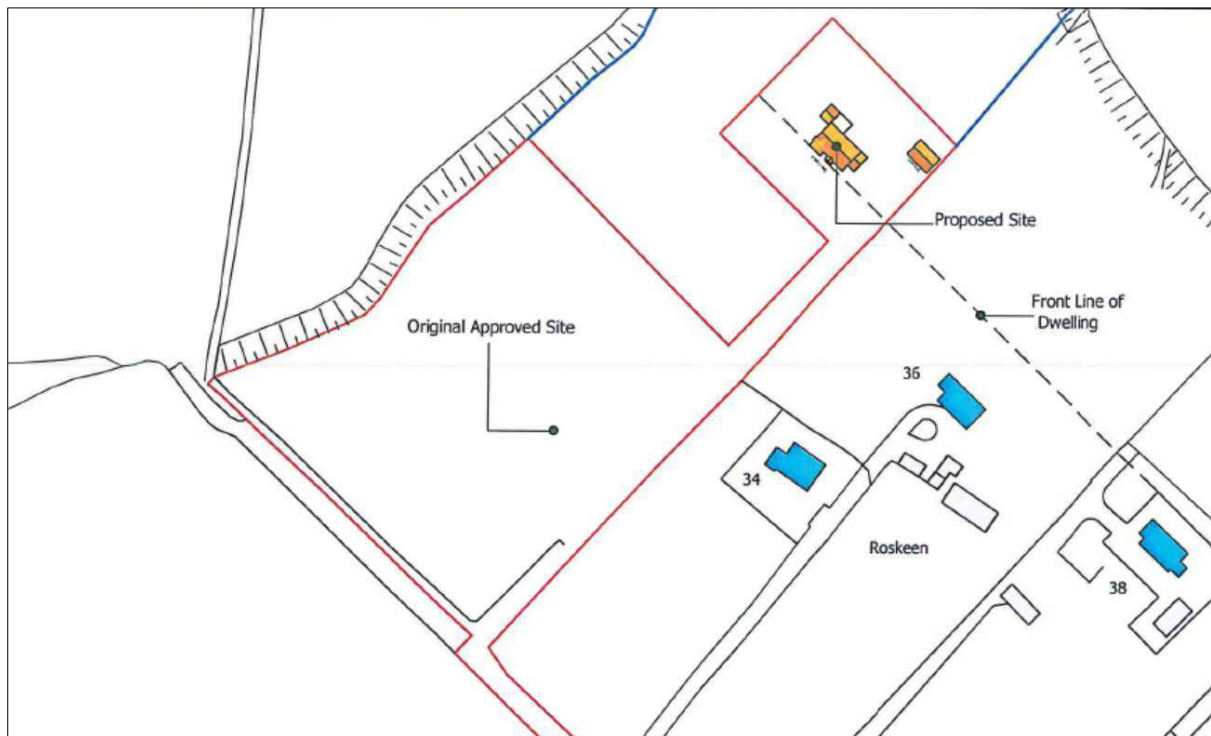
Current site location plan showing approx. location of previously approved dwelling and garage; and location of the change of house type including garage proposed.
